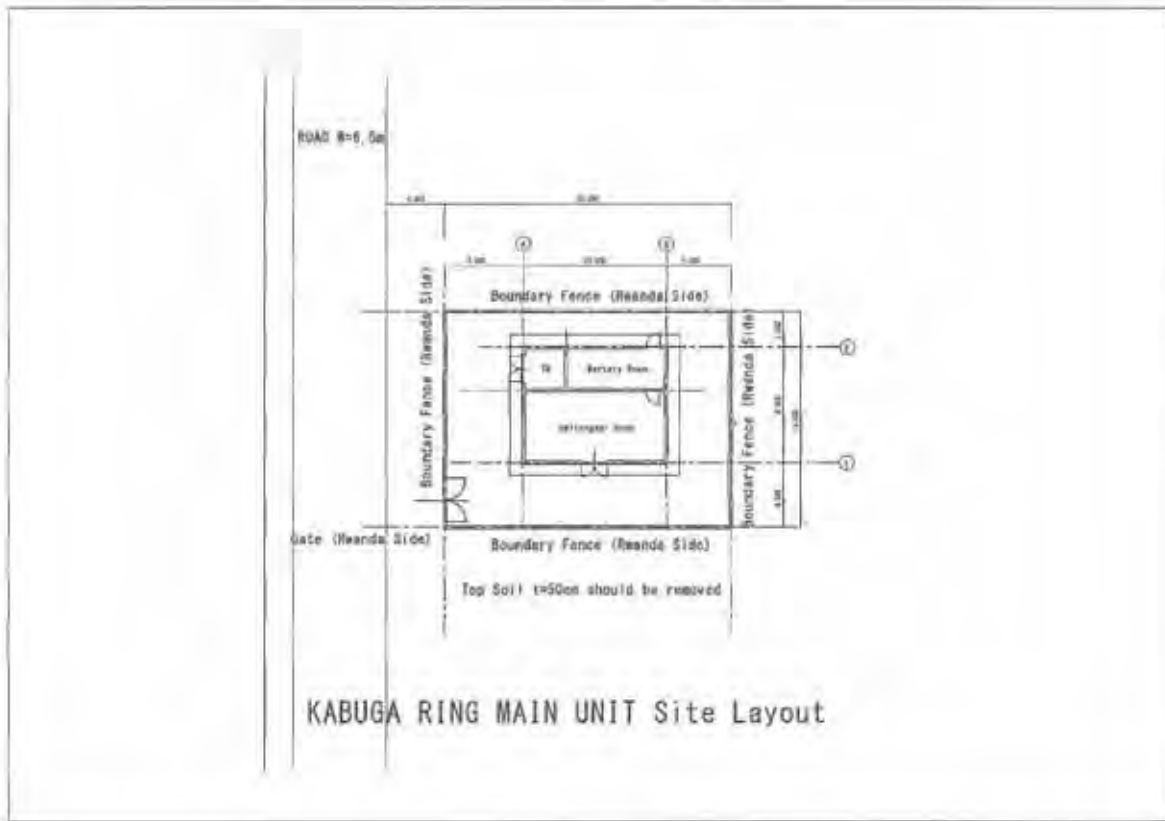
Land Preparation Work Site Layout at Kabuga RMU Switching Station
